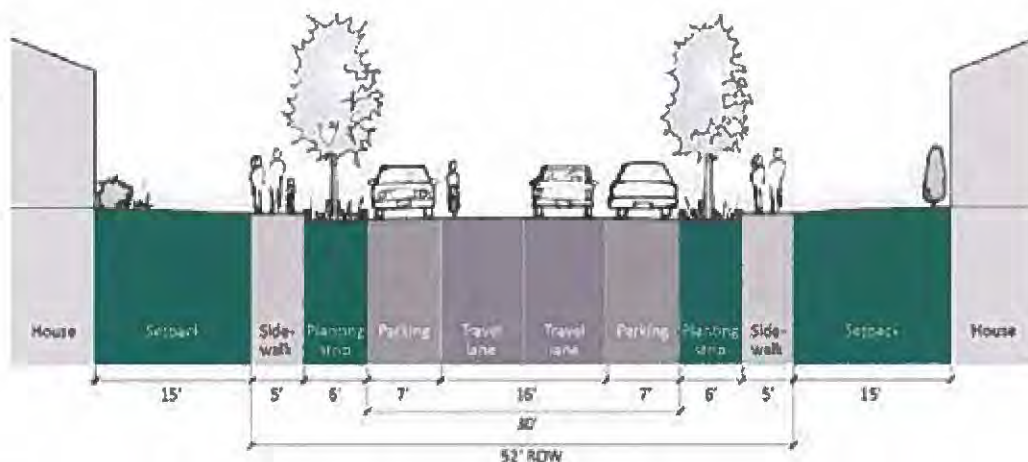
Cross-sections for local access street design options (with standard dimensions).
